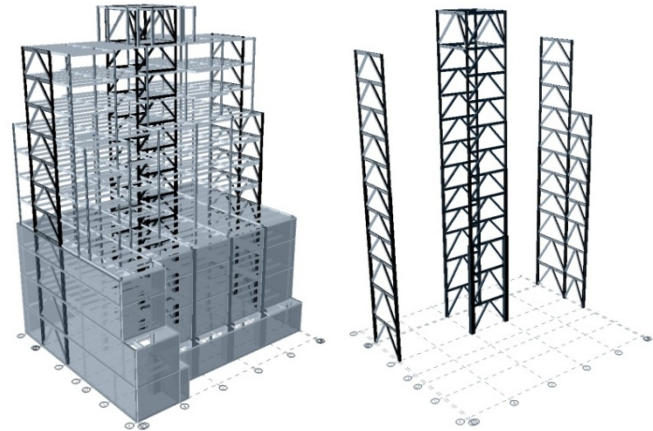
246 West 17<sup>th</sup> Street lateral brace system
